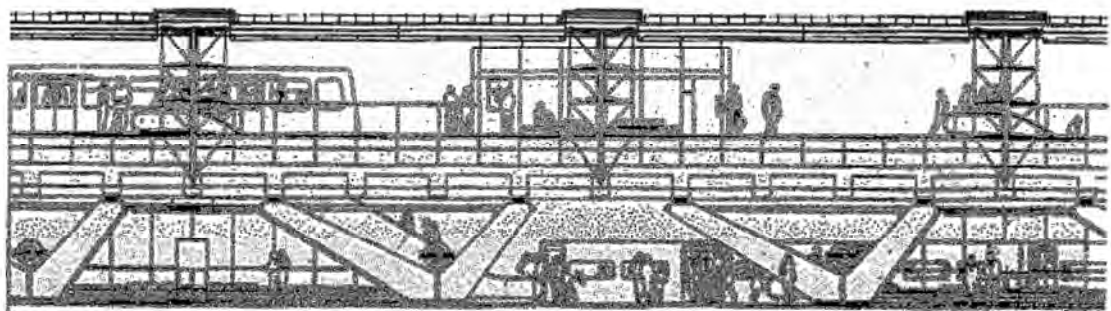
Detailed Jubilee and Docklands Elevation (Davey, 1999)
